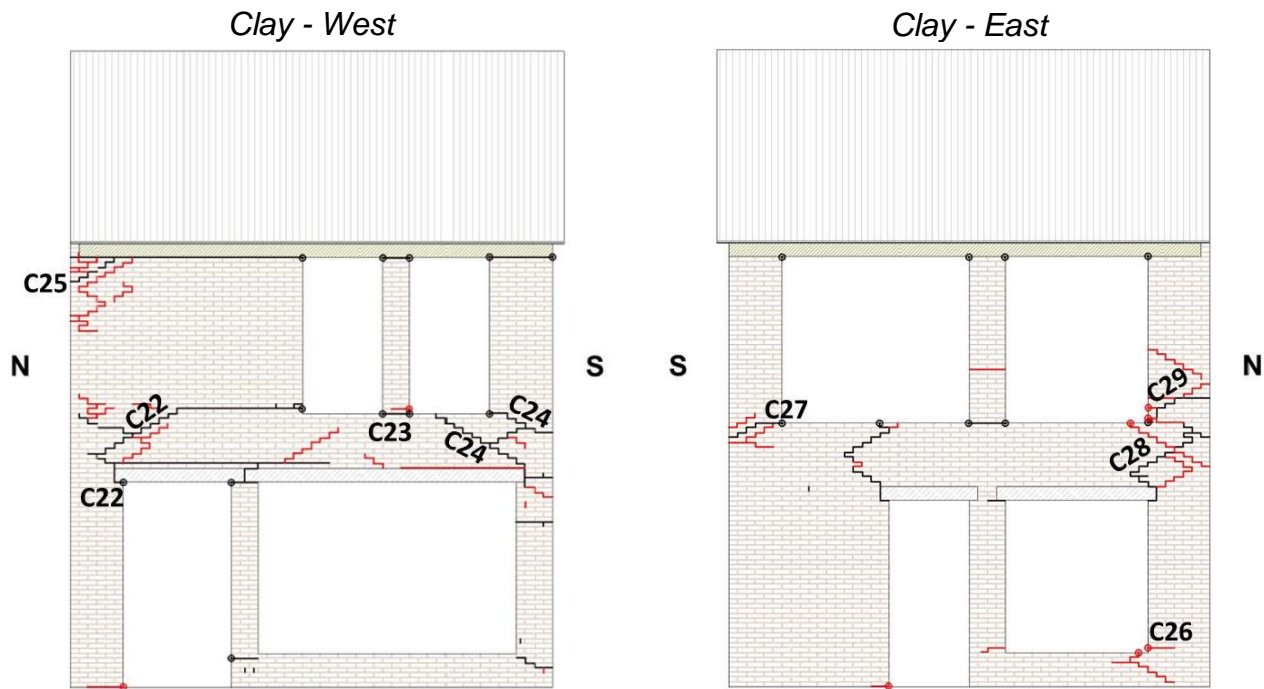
EQ-NPR 100% cracks – West and East clay façades
